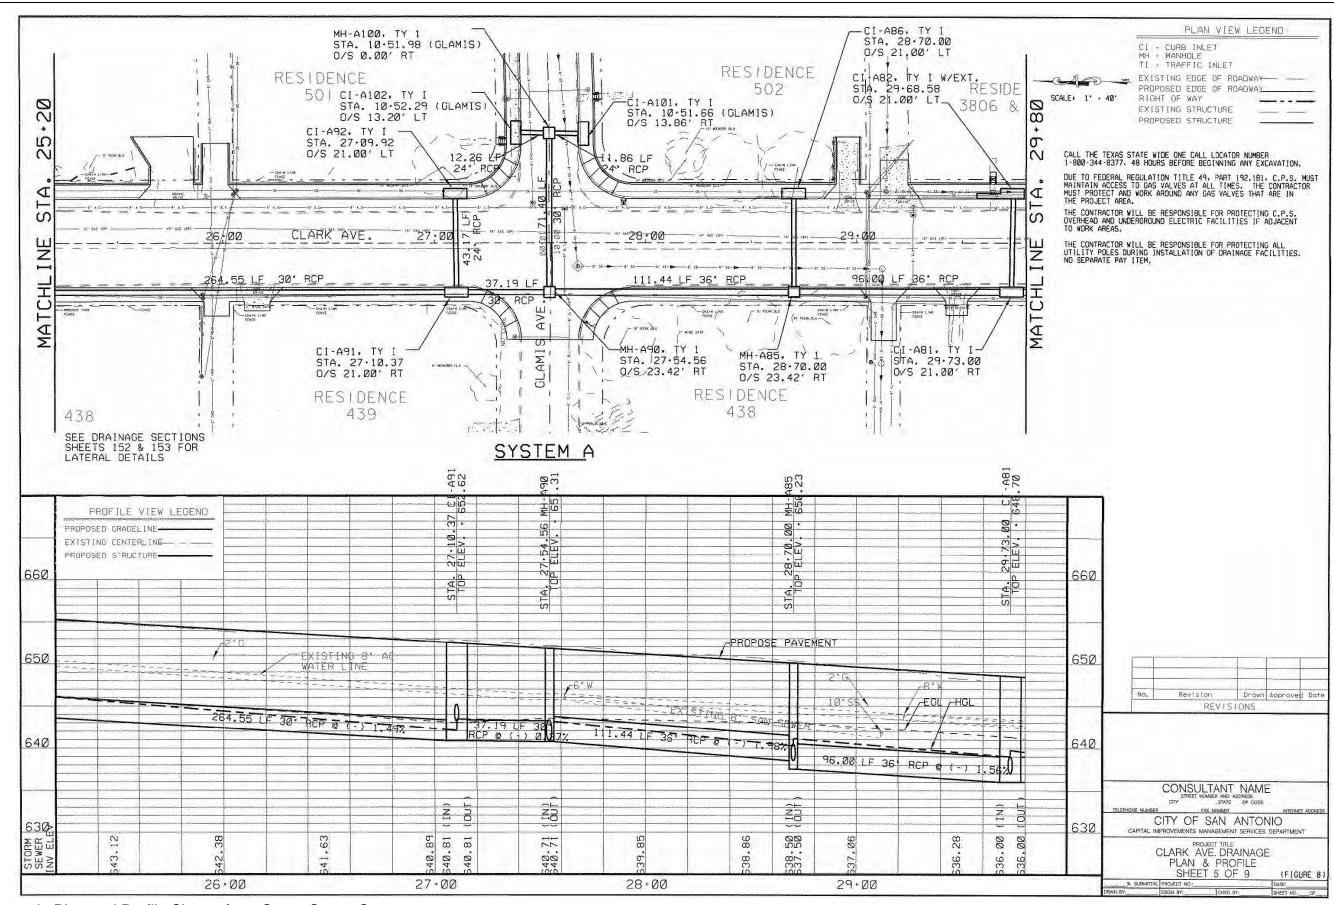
Example Plan and Profile Sheets for a Storm Sewer System
